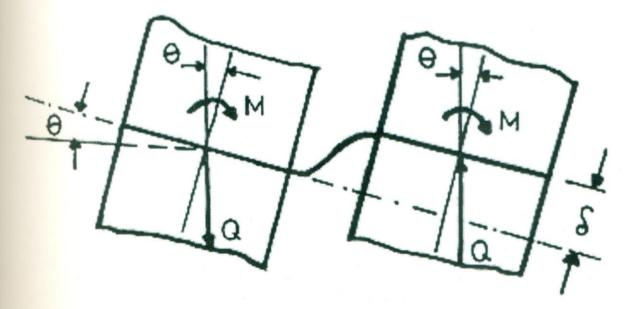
Deflected shape of the connecting beam in a shear wall structure
